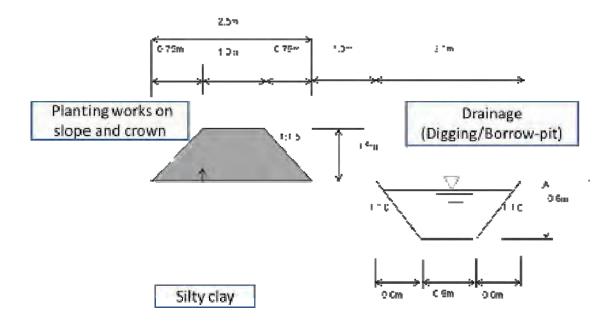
Standard Cross Section of Raised Access Road
